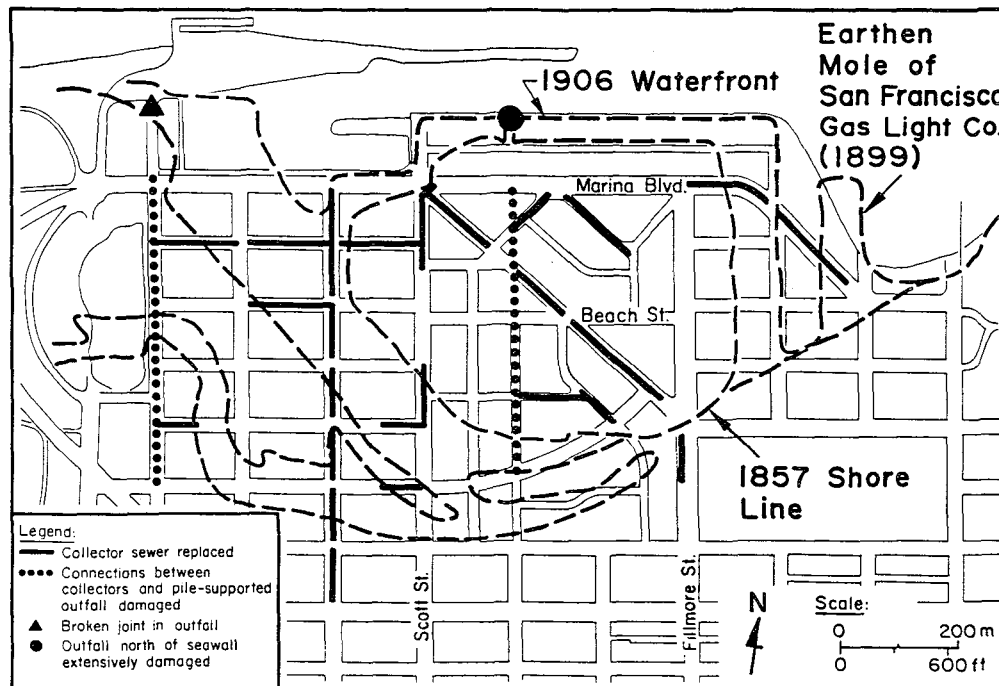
Plan View of Damaged and Replaced Wastewater Conveyance System in Marina
